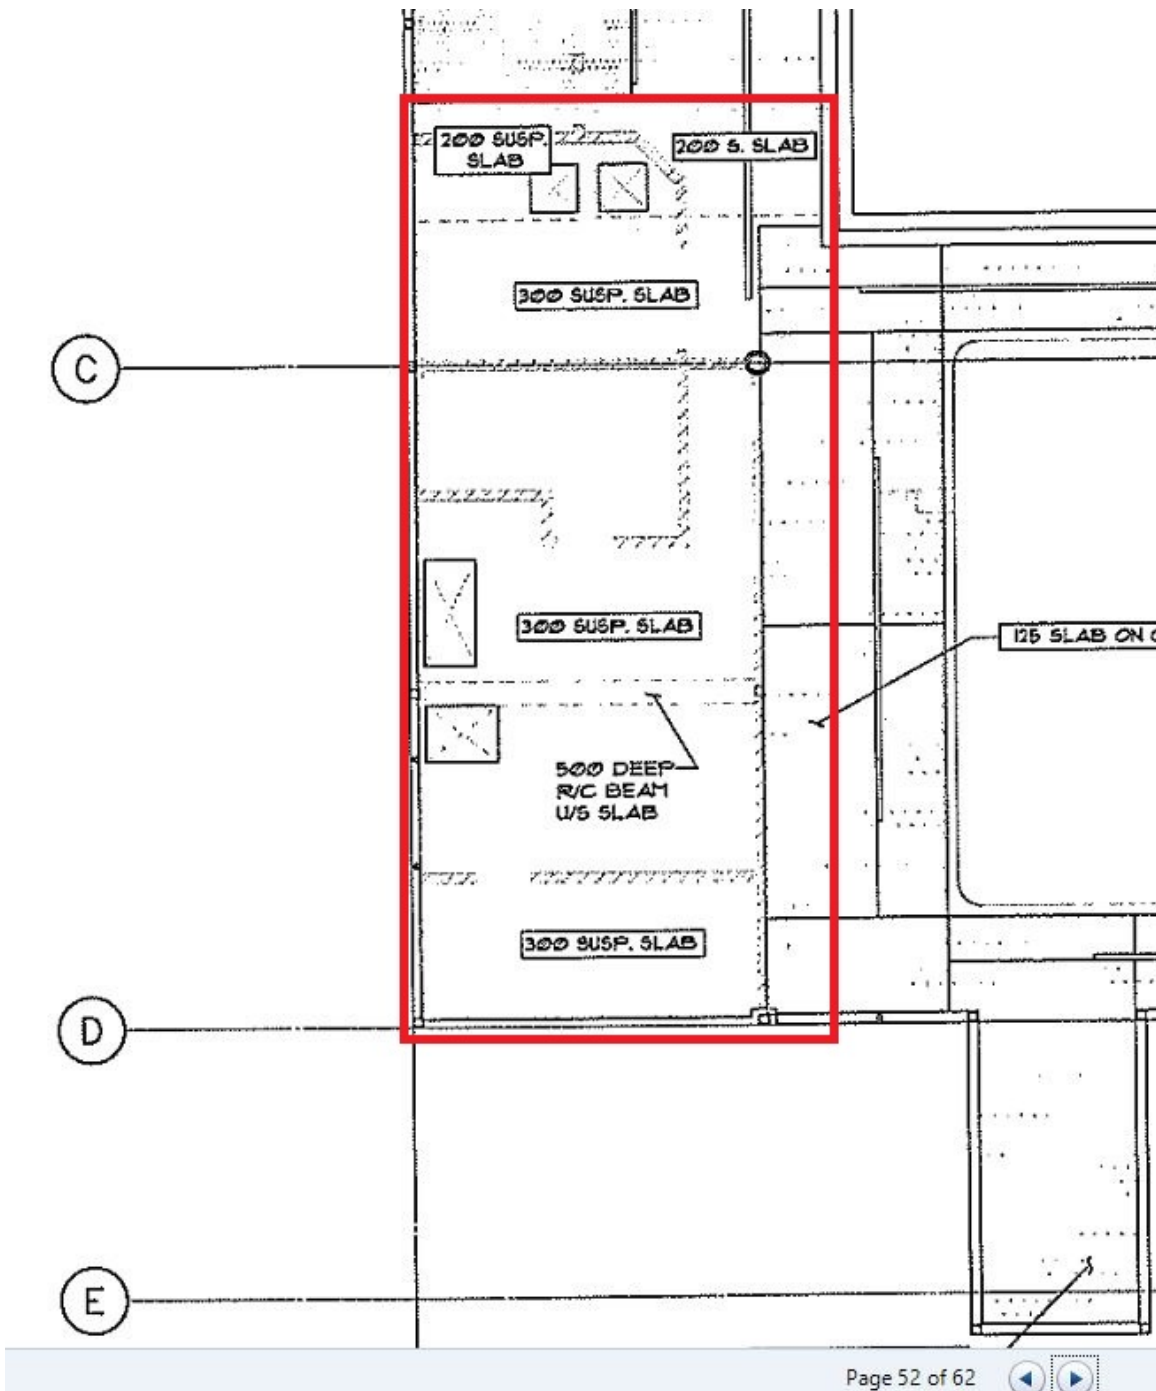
Plan View of Backwash and Surge Tank Suspended Slab Area
